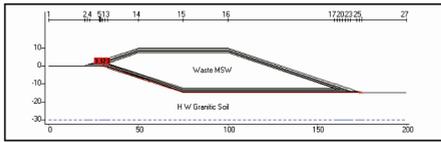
Typical failure section within bottom liner for Case 1 to 5.
